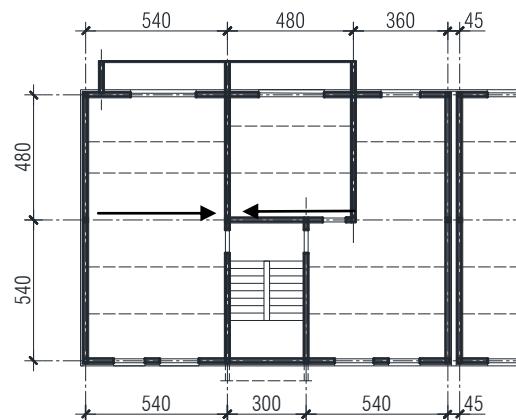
Floor plan of the repetitive structure of the Wk-70 large-panel building - own work [3,4,5]
